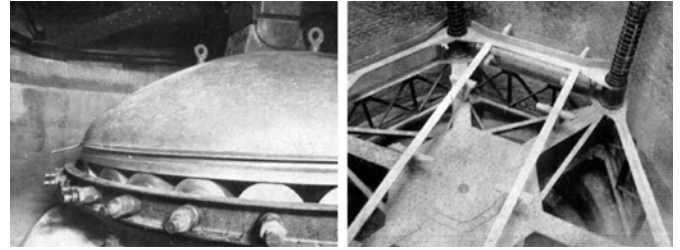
The metal bearing and the reinforced concrete beams (“Vierendeel”). (Image source: Piacentini M, 1936, p. 7).
